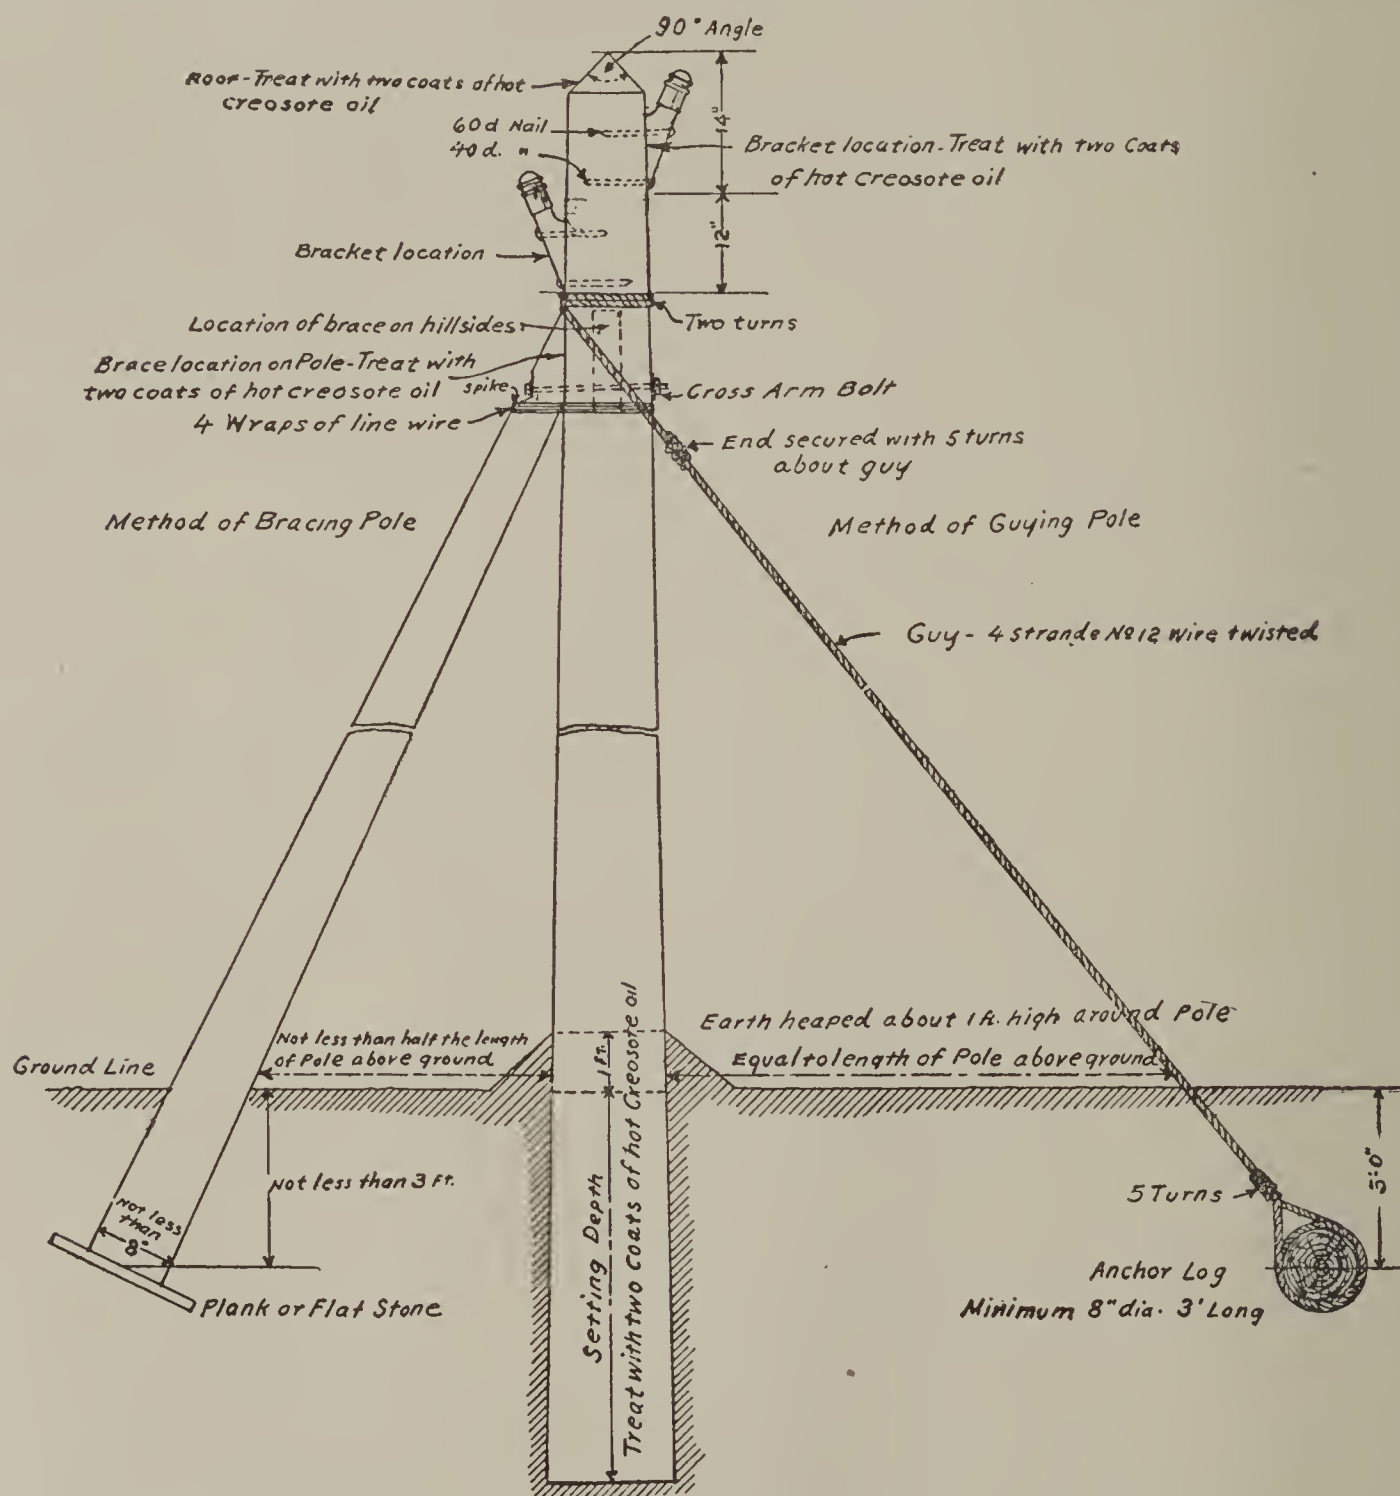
Diagram showing method of setting, guying, and bracing pole and locating brackets.
